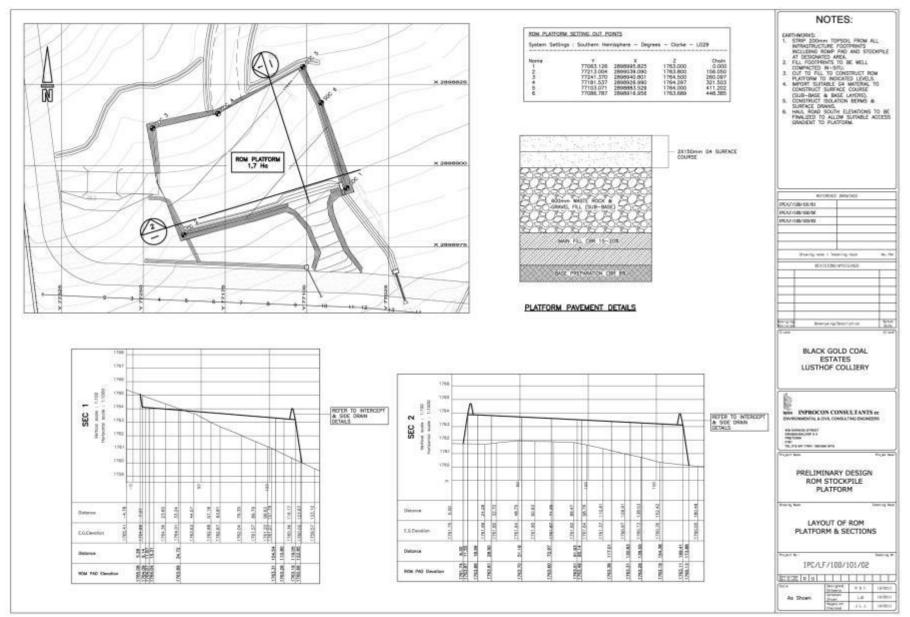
(b): ROM Stockpile Platform - ROM Platform Layout and Sections.
